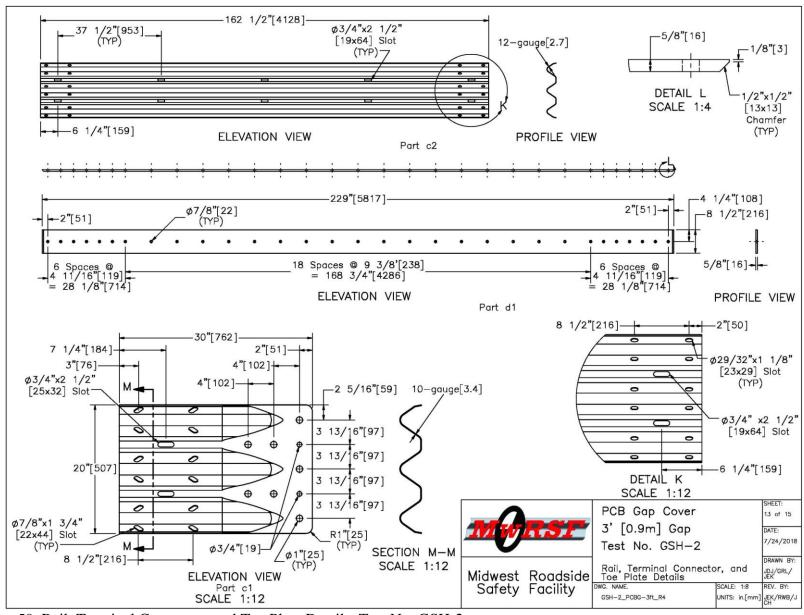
Rail, Terminal Connector, and Toe Plate Details, Test No. GSH-2
